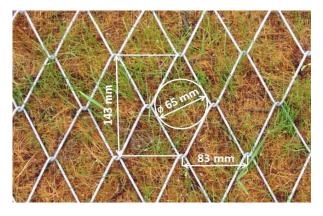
The shape and dimensions of high-tensile steel wire mesh G65/3
